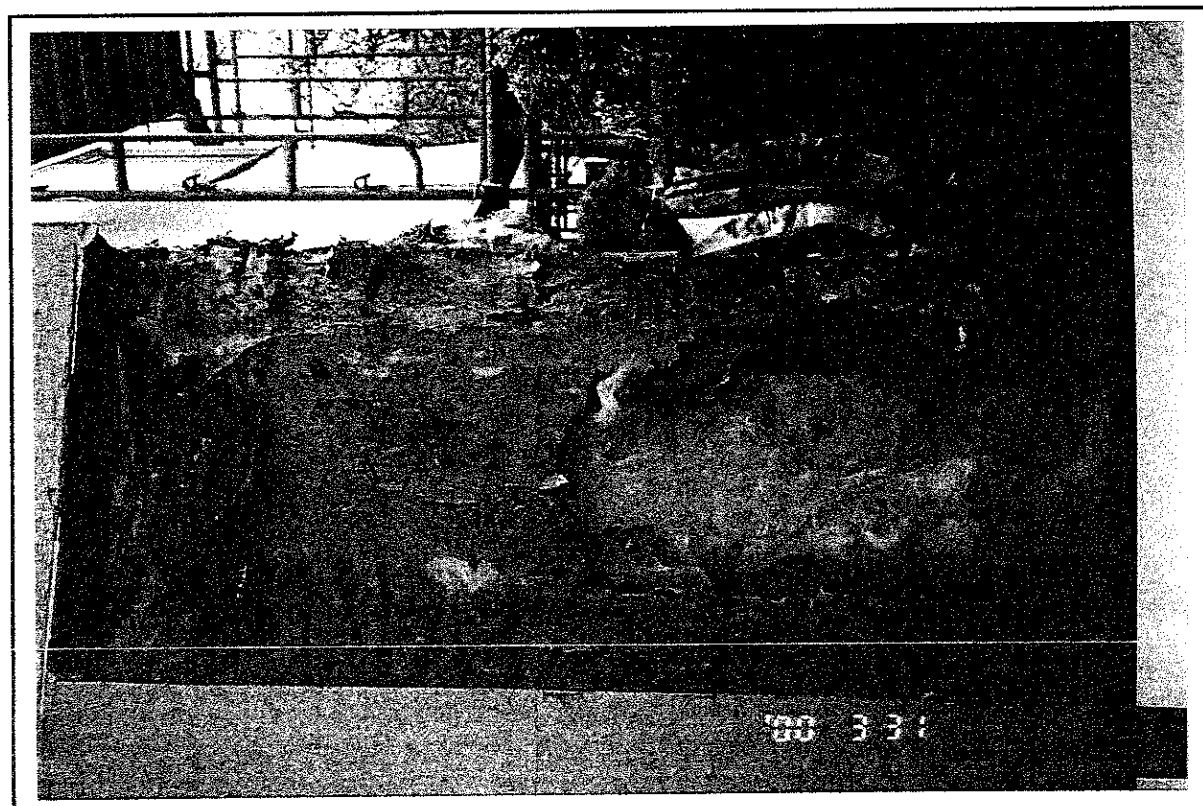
Test Area #9 – Completely saturated and deteriorated gypsum sheathing
